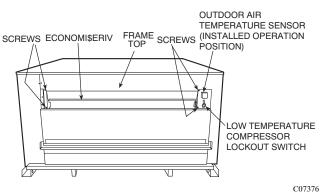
EconoMi\$er IV Assembled in Unit — End View (13 to 25 Ton Units)
